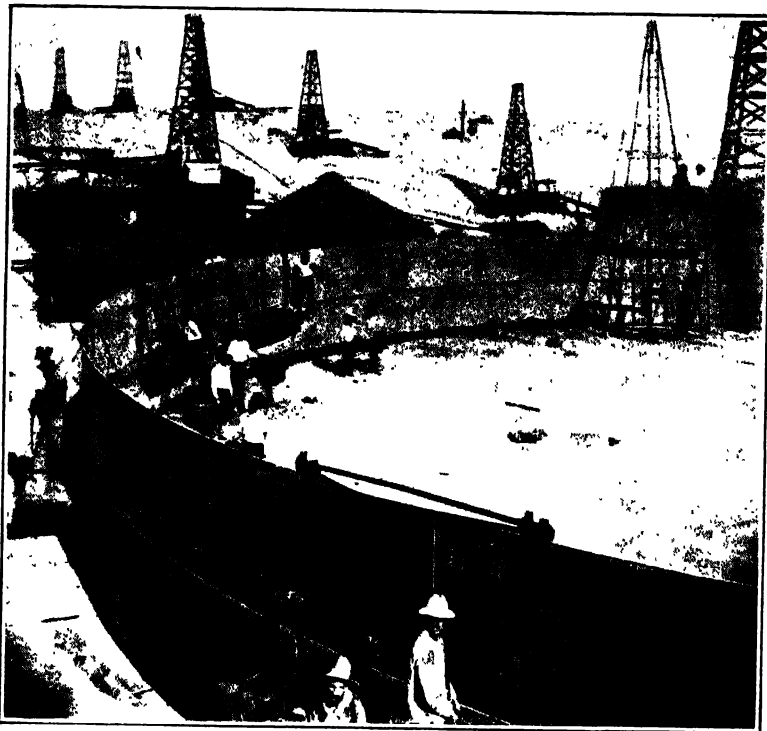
Showing method of assembling shell of large riveted steel tank.
